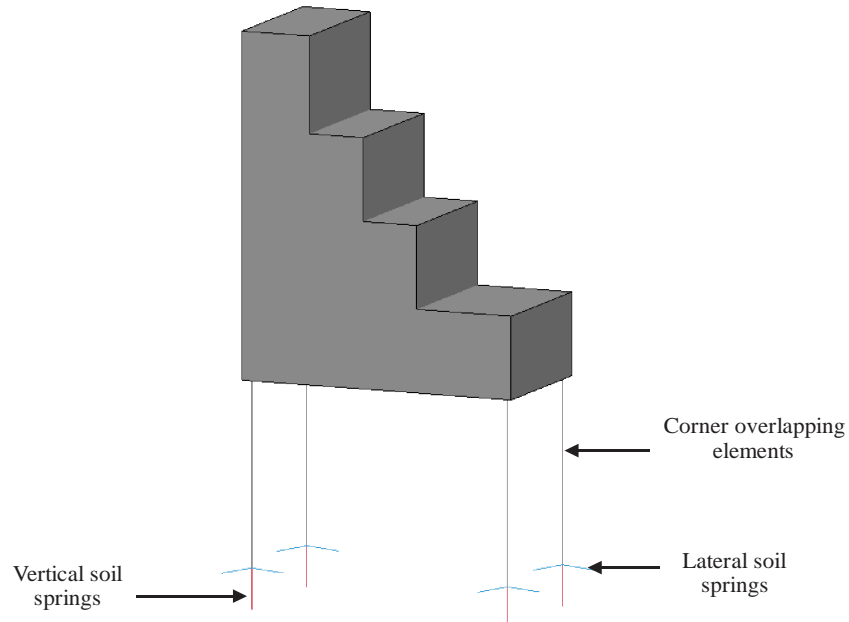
Corner overlapping elements modeled as beams every 10 ft.
